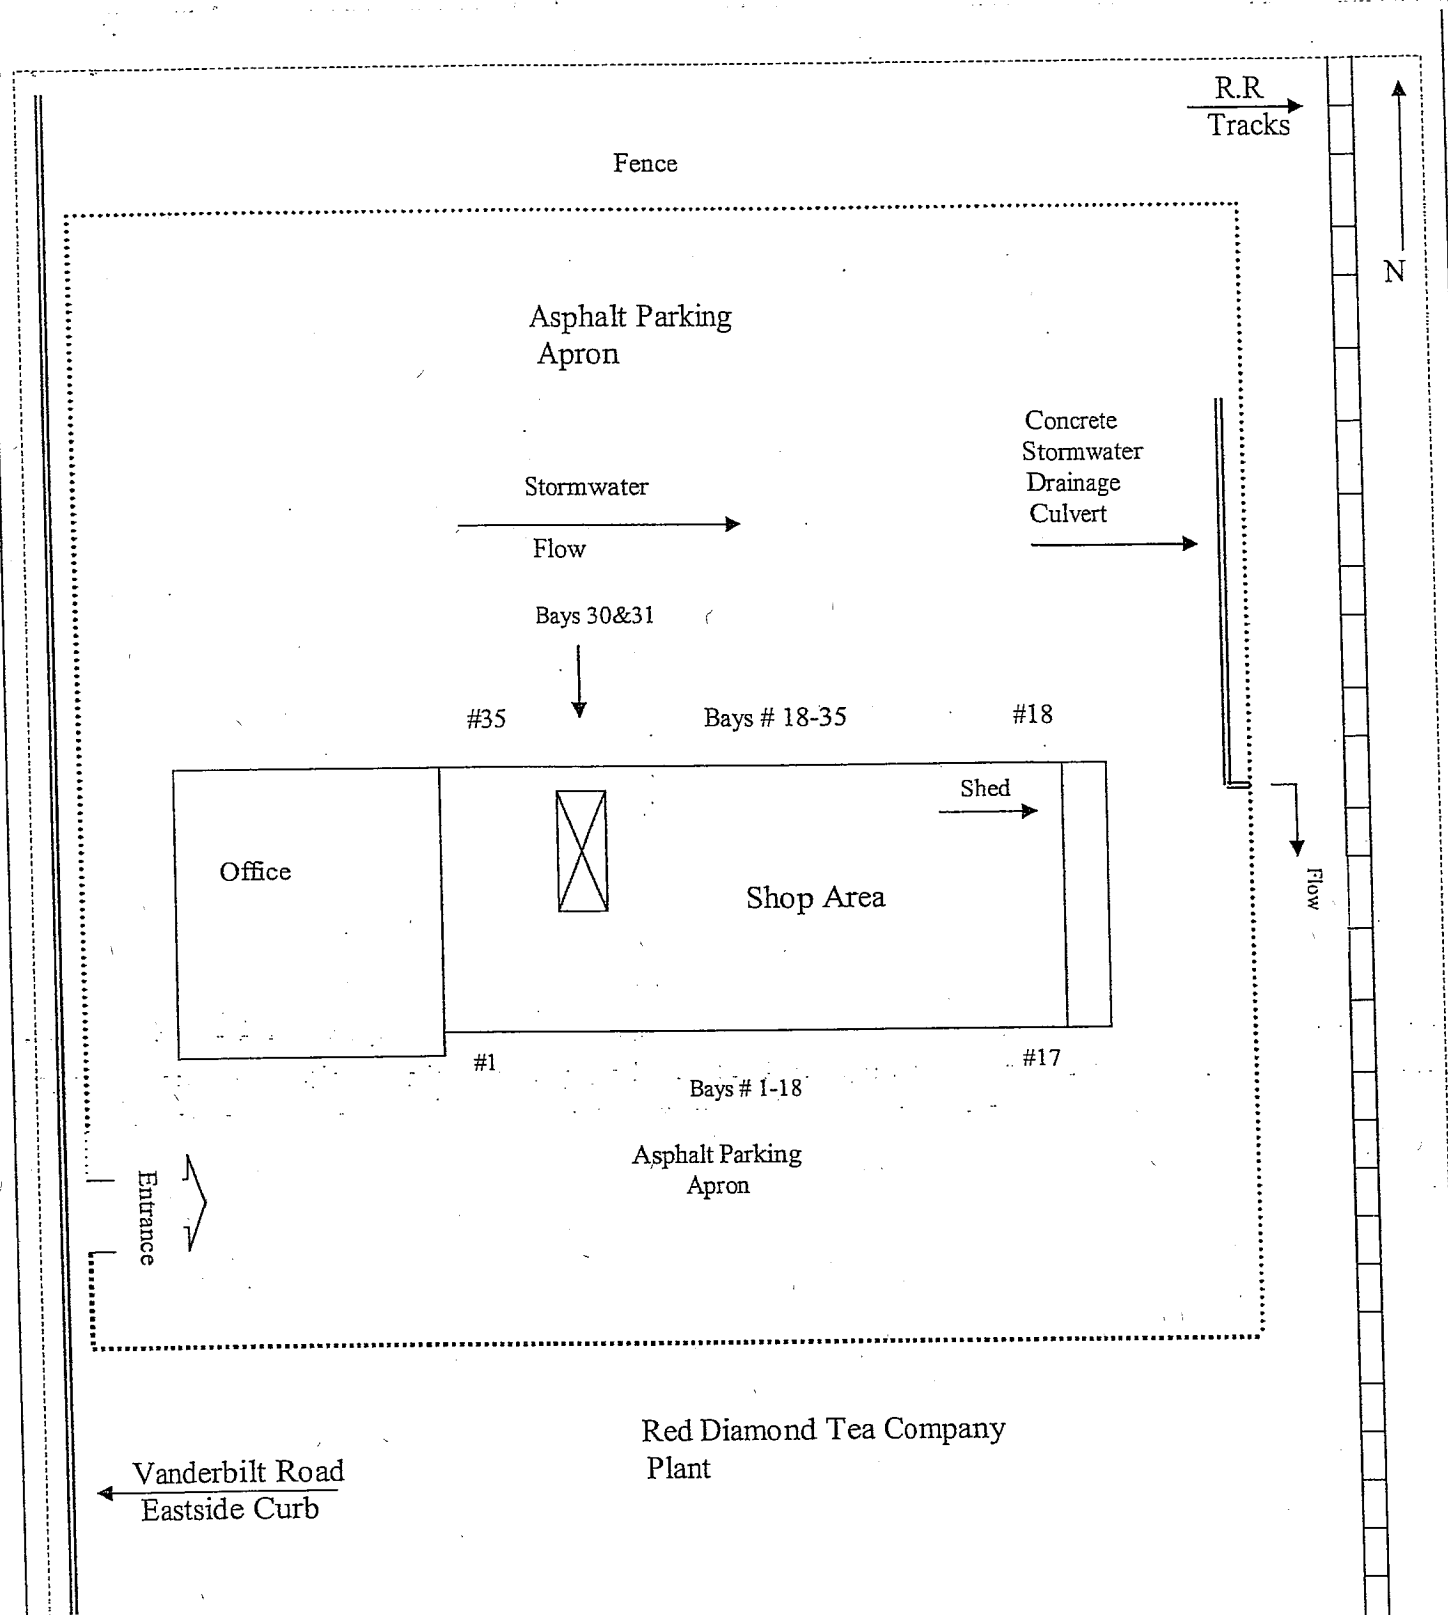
, Diagrams of facility, AST location, and details of secondary containment structure.
